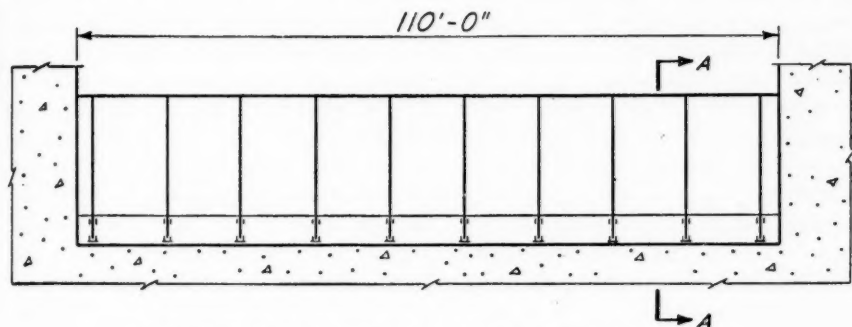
EMERGENCY DAM OF TRUSSED BULKHEADS WITH ROLLERS, BASED ON THE INSTALLATION AT BONNEVILLE DAM ON THE COLUMBIA RIVER
